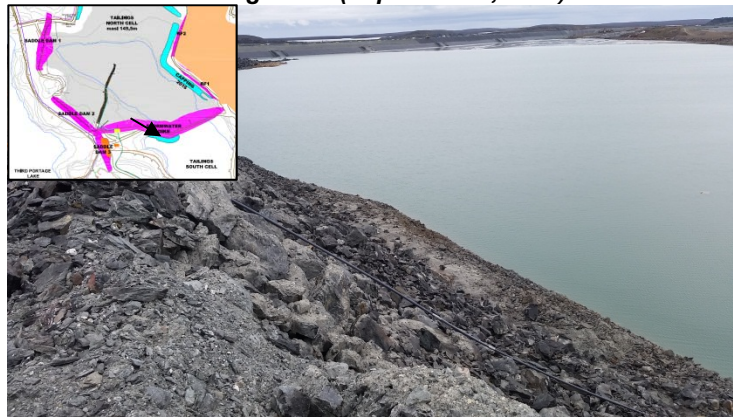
Photo of the Stormwater Dike downstream slope toe area prior to buttress construction looking east towards Central Dike (August 31, 2016).
